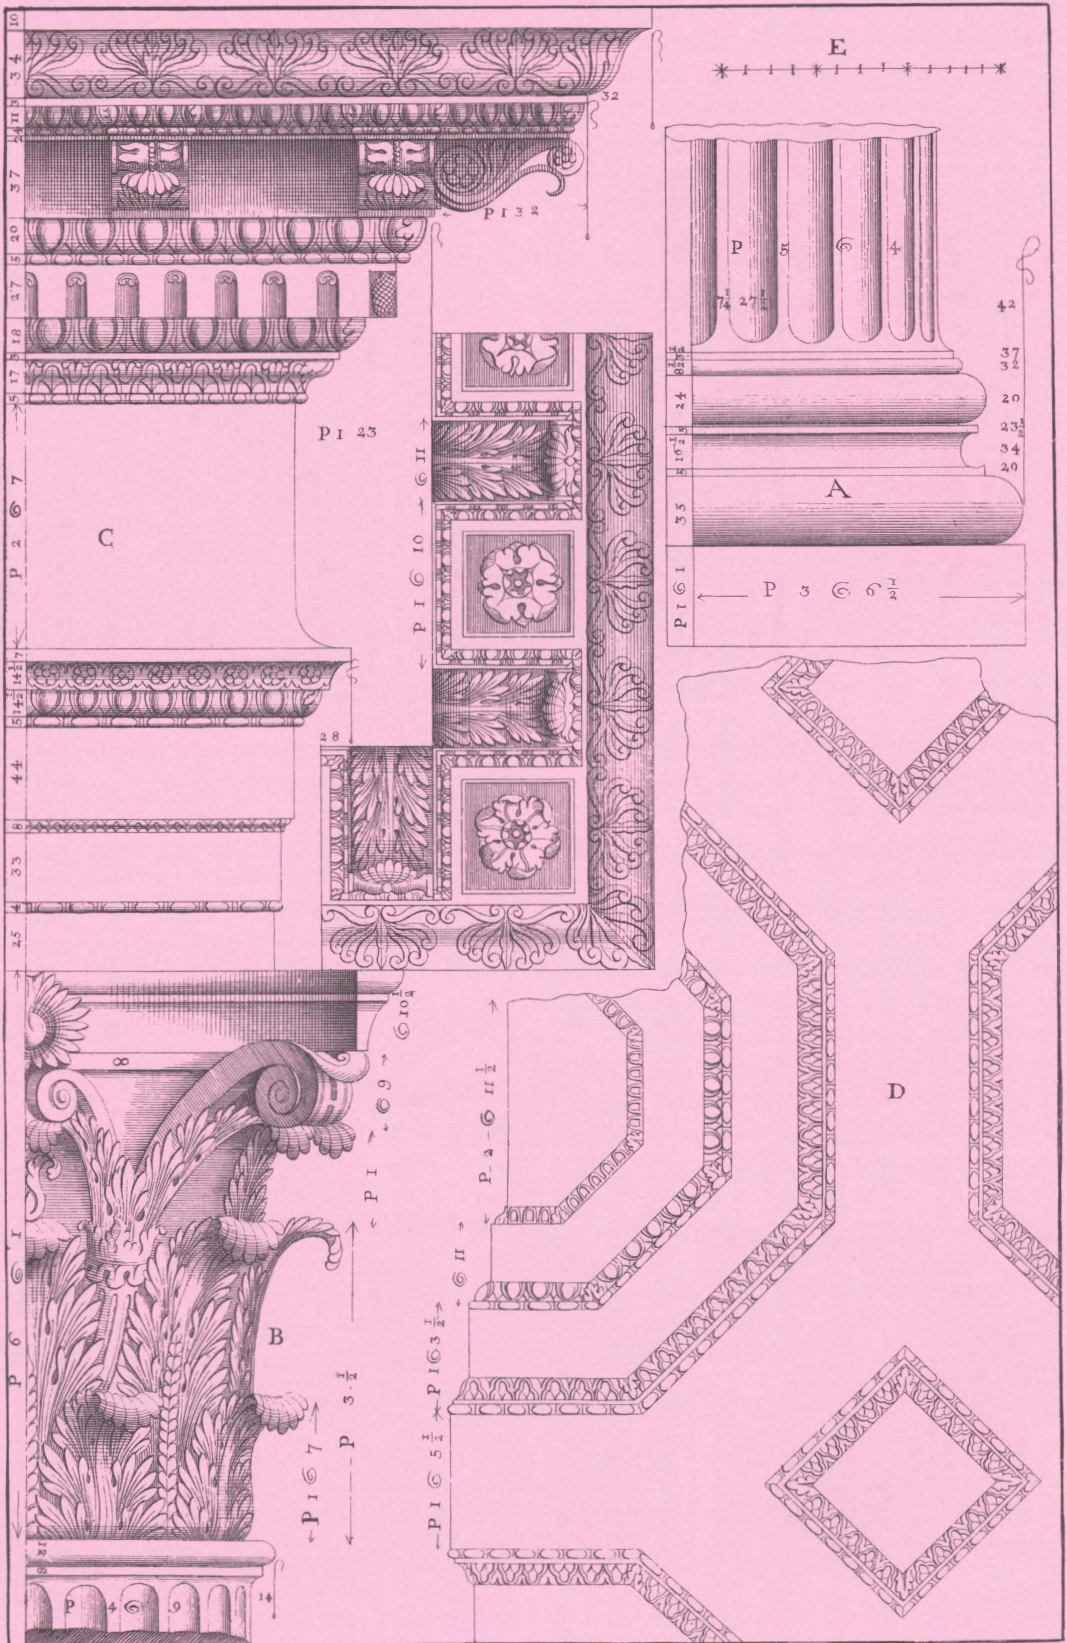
Palladio, reconstruction of the Temple of Peace. Details
